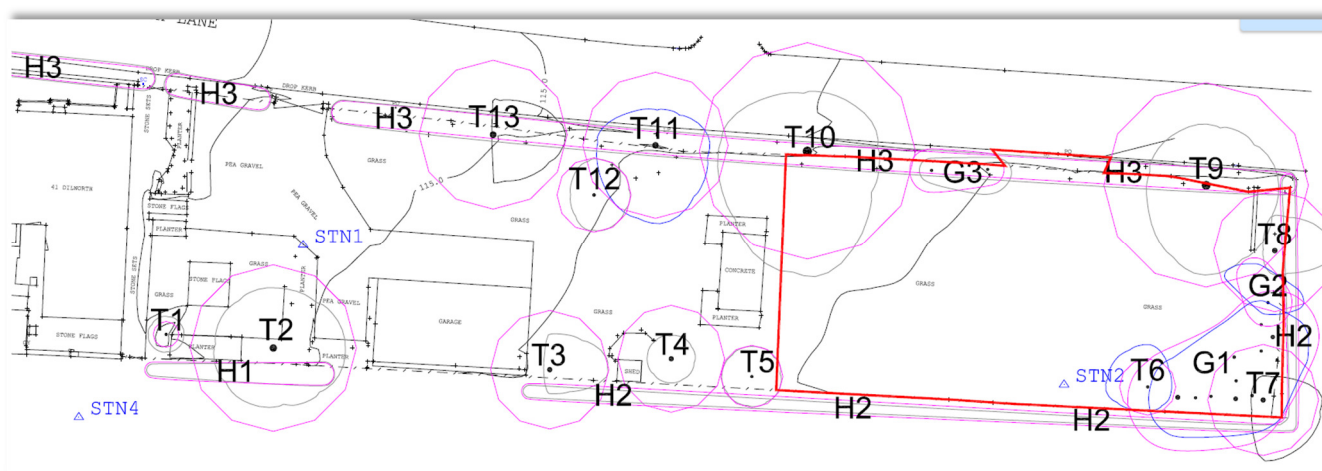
Site Plan and adjacent land of 41 Dilworth Lane, Longridge
